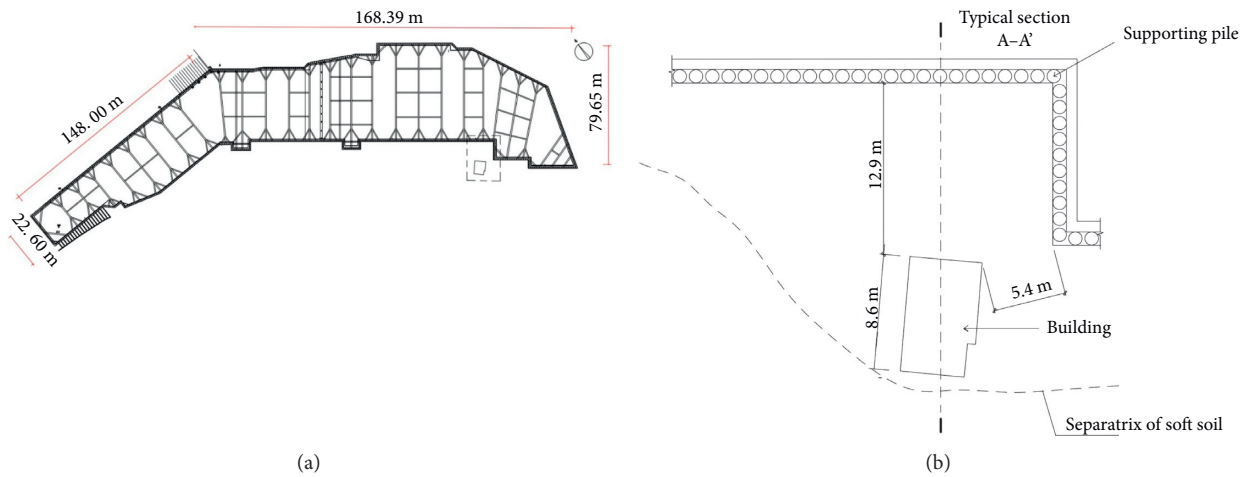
(a) Layout of the foundation pit. (b) Layout of the building.
